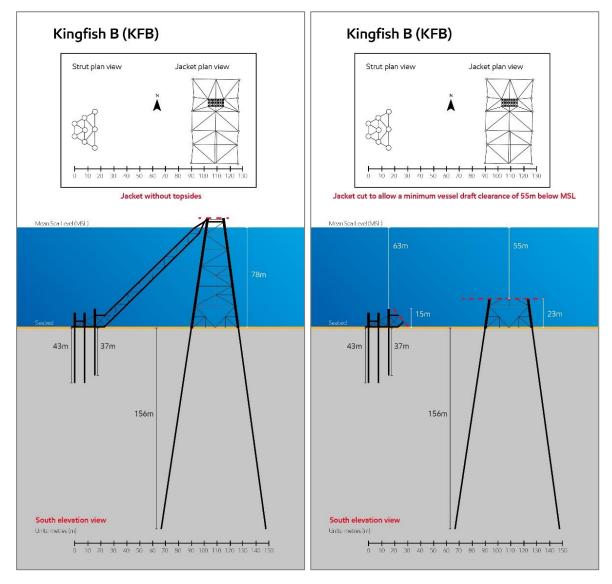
Kingfish B Steel Piled Jacket without topsides (left) and under proposed end state (right)
